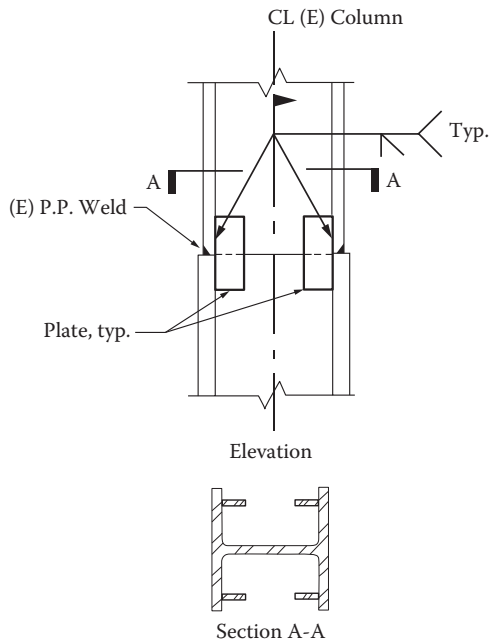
Welded splice upgrade at existing column.
